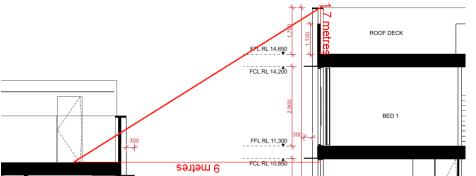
Planning officer mark-up of Section A showing view line between roof terraces
